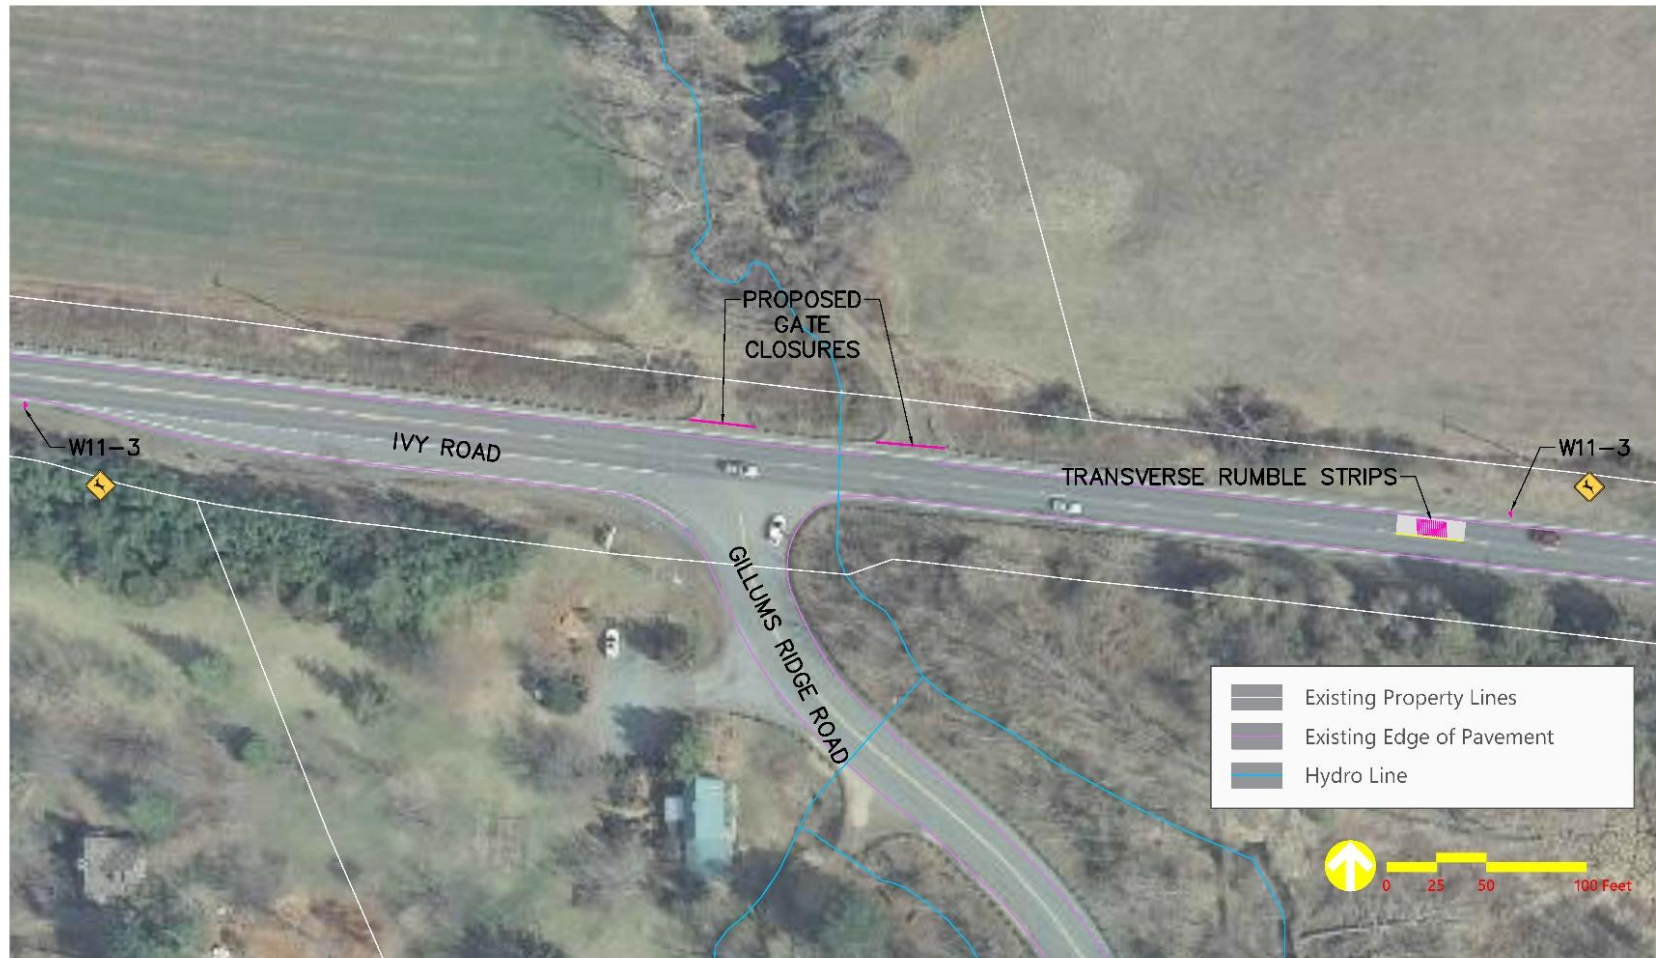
Short-Term Concept for Ivy Road and Gillums Ridge Road
